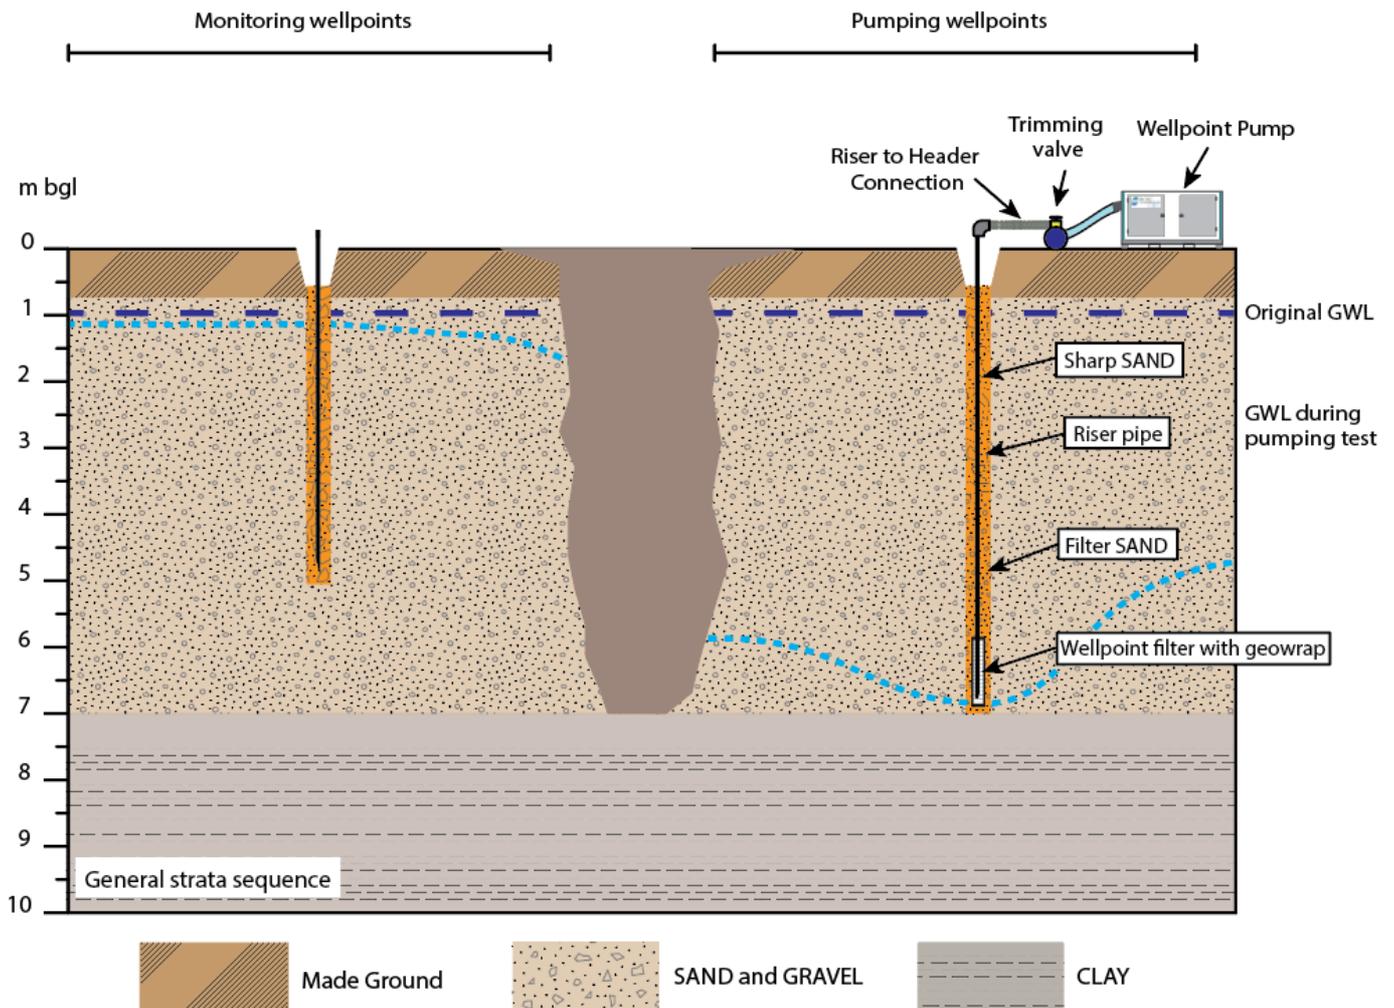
Indicative cross section drawing of the pumping test conducted by PDL.
